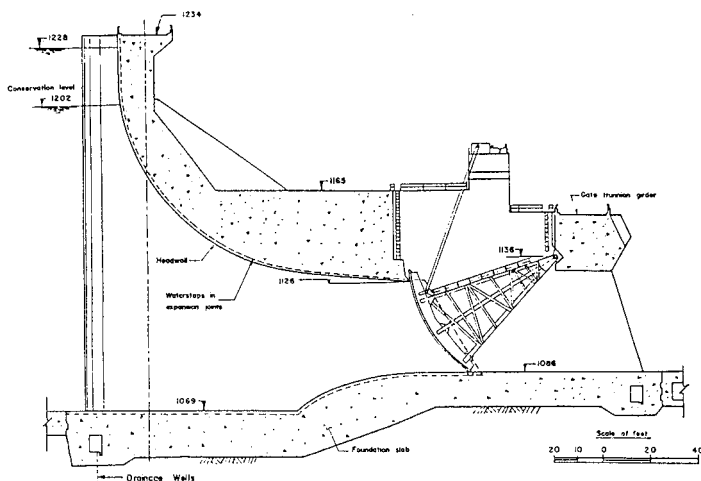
Typical arrangement of an orifice spillway control structure. (Institute of Civil Engineers, 1968)
